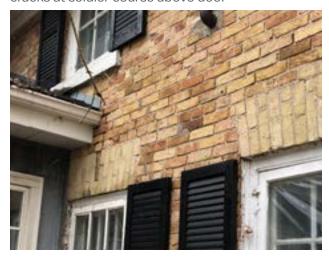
West facade: Facade soiling & missing brick at soldier course
